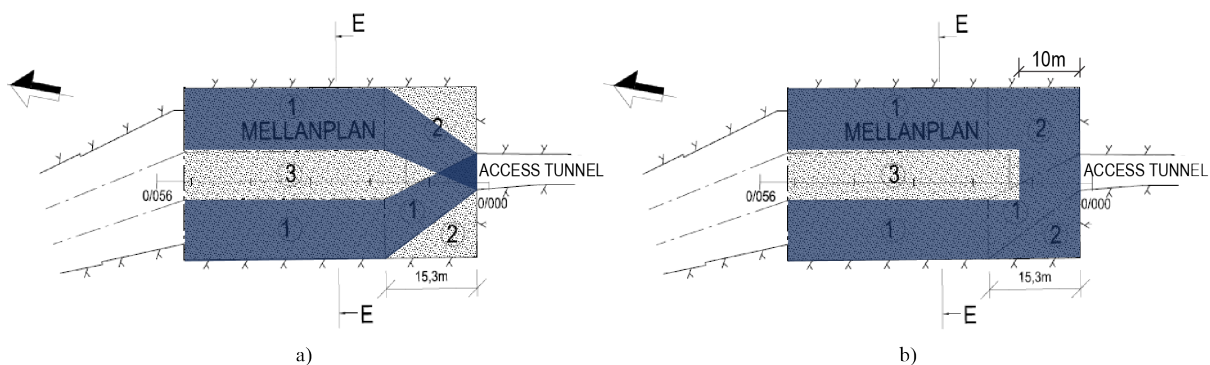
Plan view of Mellanplan from above. a) Blue overlay illustrates the actual excavation shape. b) Blue overlay shows the excavation shape in *RS3* models. Figures modified after: Trafikverket (2022d).
